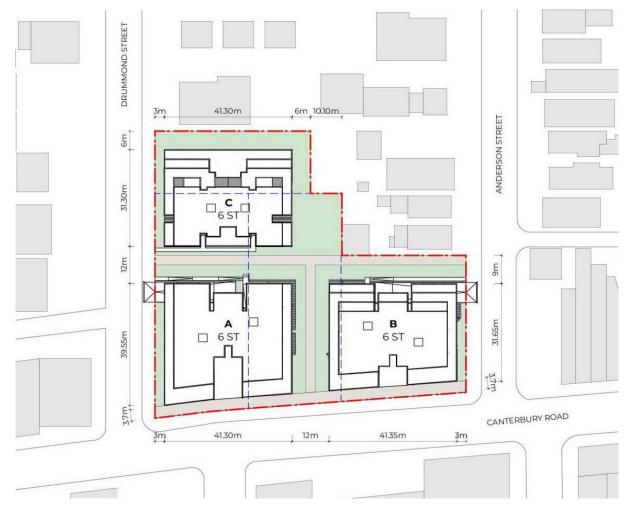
| Proposed Site / Roof Plan by Aleksander Projects Architects
